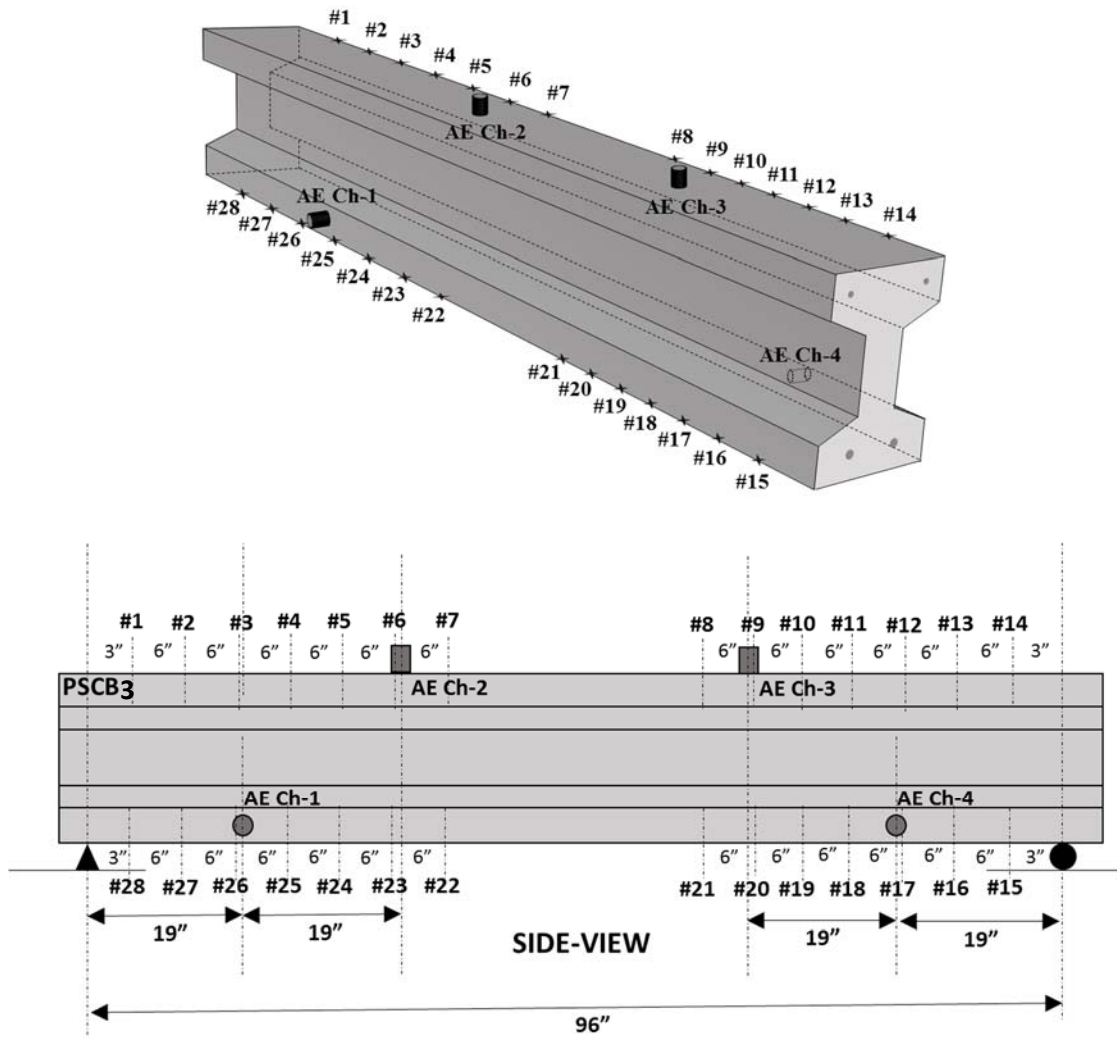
Pencil-lead-break stations of the prestressed concrete beam.
